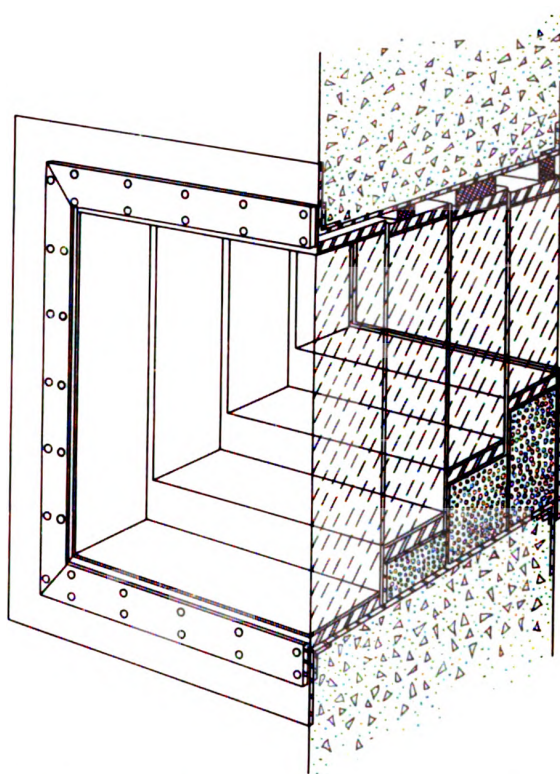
Cross section of permanent wall showing lead-glass slabs in window.
